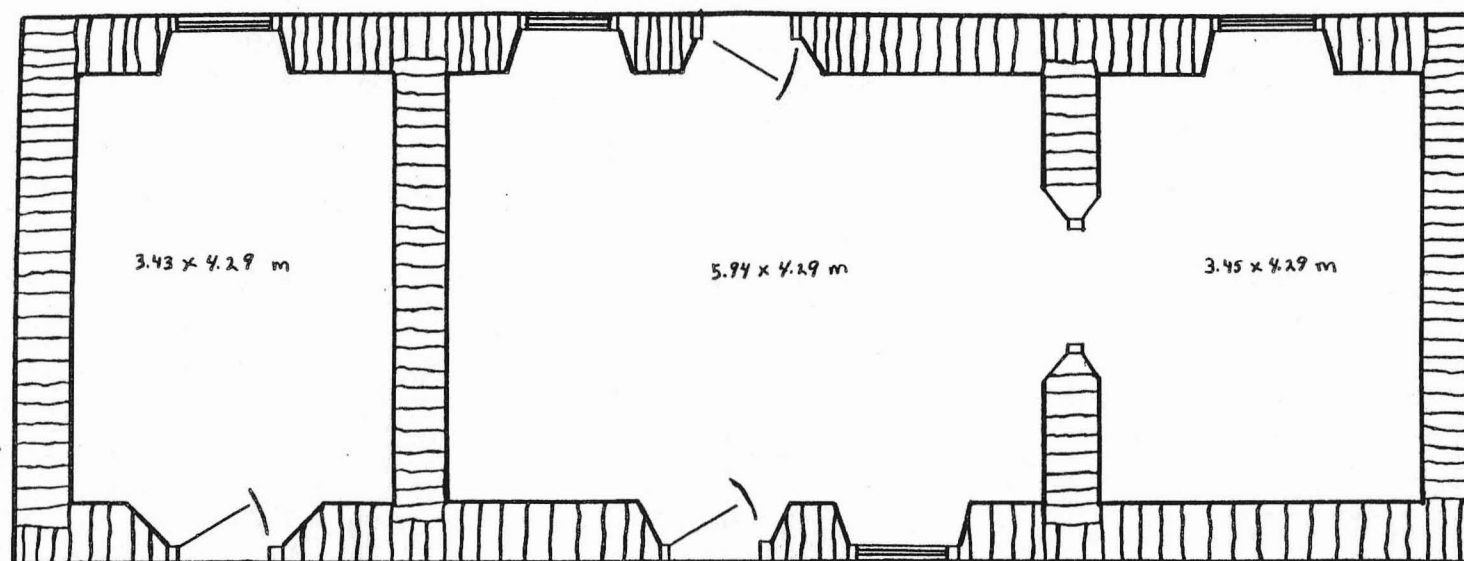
Floor plan of the original circa 1842 Peña Adobe. North end of the adobe is to the right. Outside dimensions are: 15.16 by 5.38 m.
